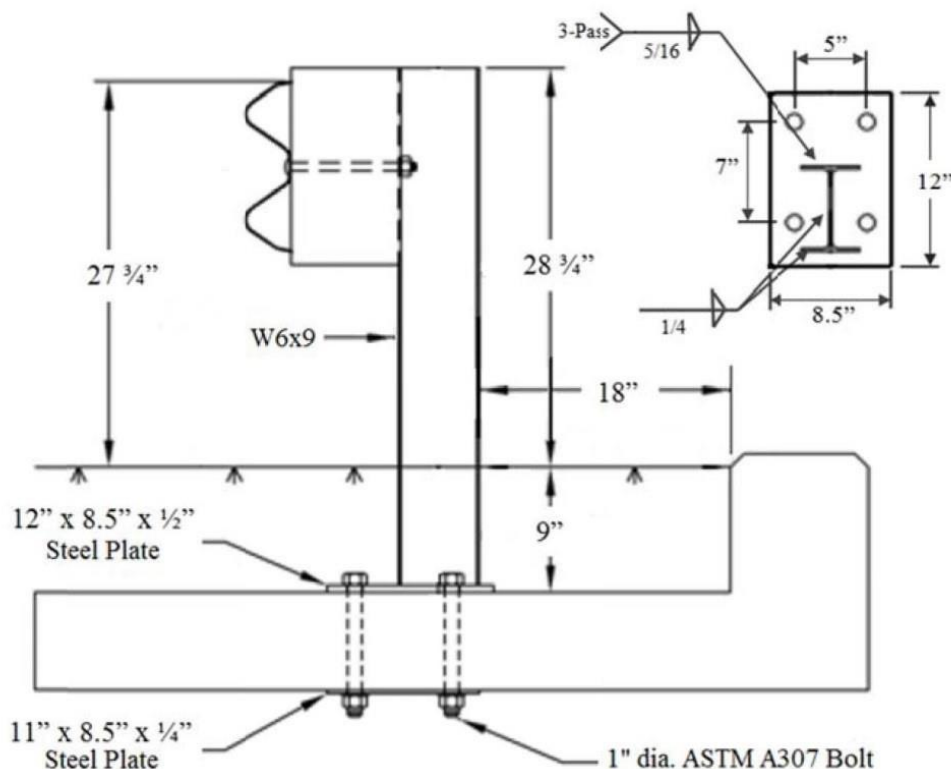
NCHRP Report No. 350-Compliant, Modified G4(1S) Guardrail Attachment to Low-Fill Culvert [5]
